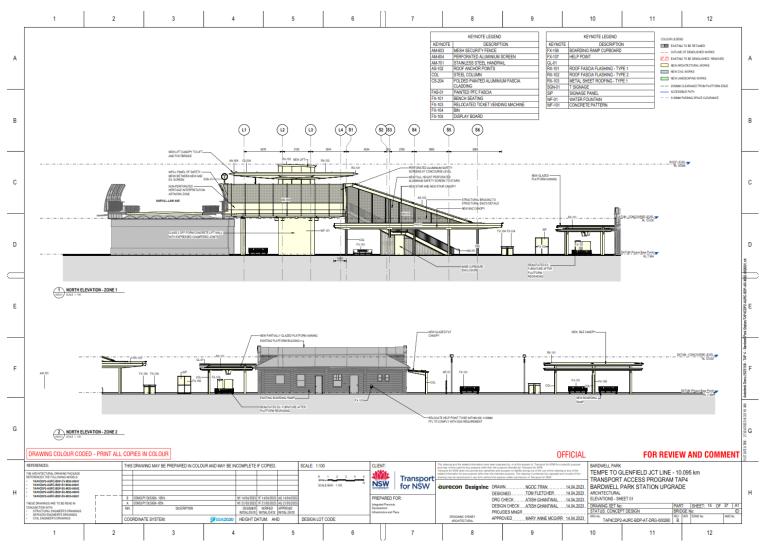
Proposed elevations for Bardwell Park Station (Source: Aurecon, 2024)
